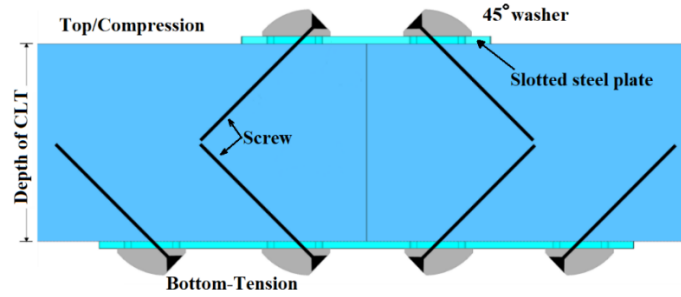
Spline connection with steel plate, washer, and inclined STS [19]
